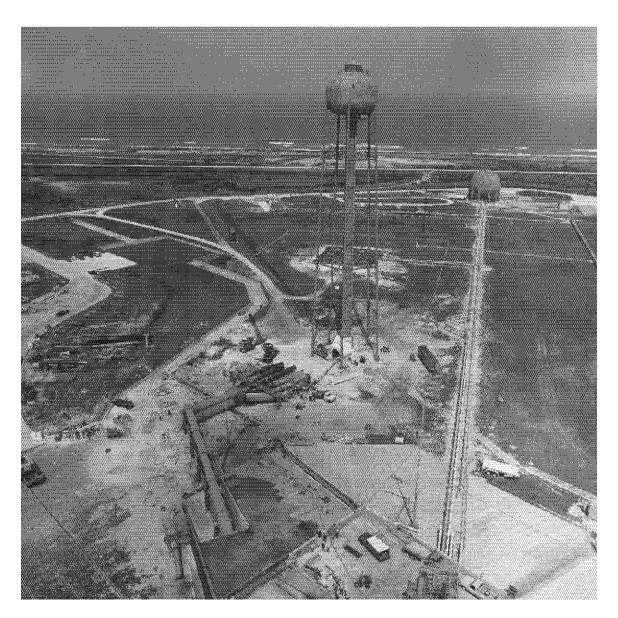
Construction of the LC39A Sound Suppression System, March 28, 1978. Source: John F. Kennedy Space Center Archives, 108-KSC-378-298 Frame 4.
